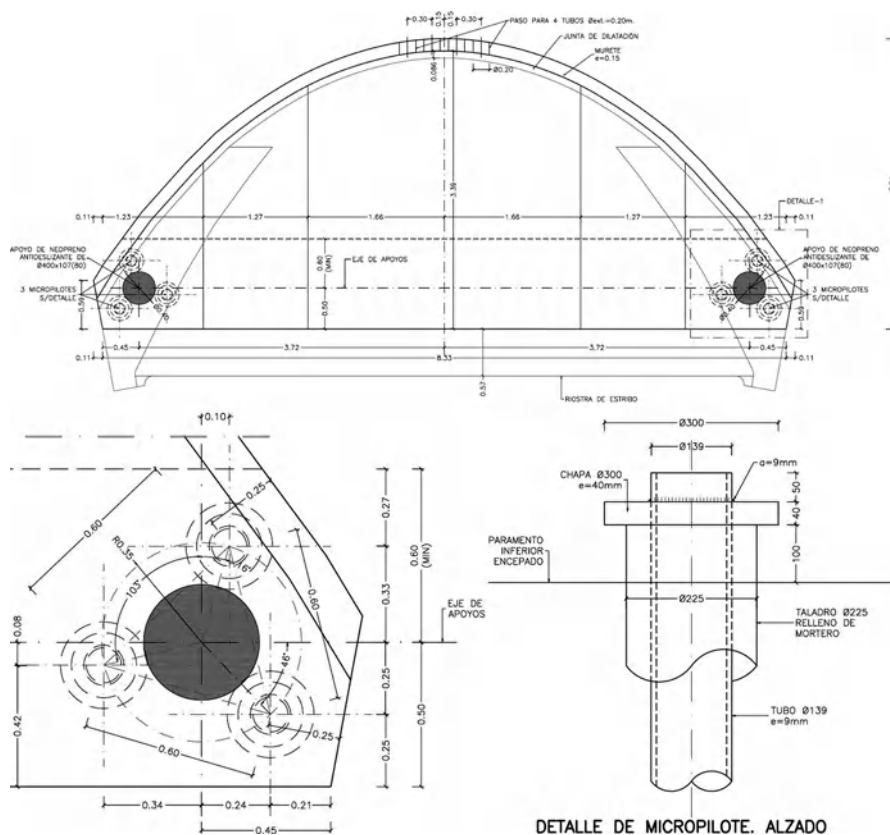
Foundation of abutments with micro-piles (Plans and detail of micro-pile top)
